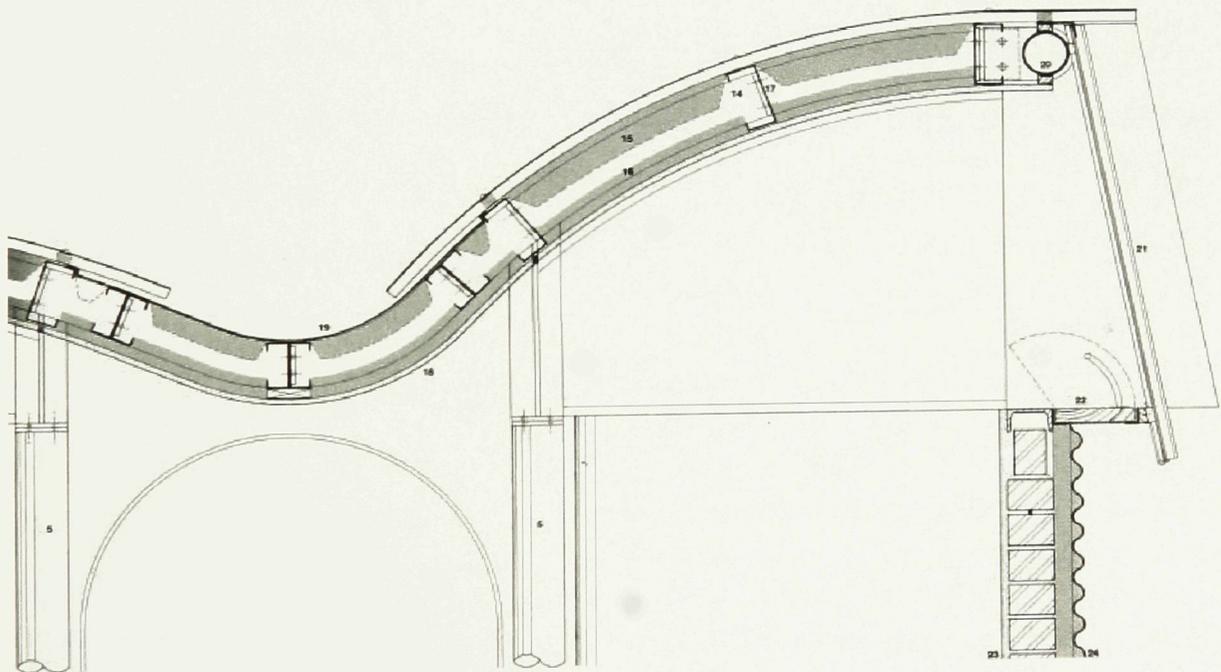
Roof and hand-operated vent detail; hand-operated strip vent labeled No.22
